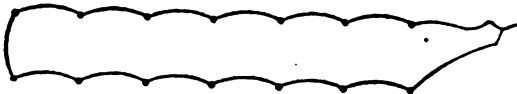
Plan Showing Method of Connecting Wires for Blasting a Large Ditch Through Dry Ground.
